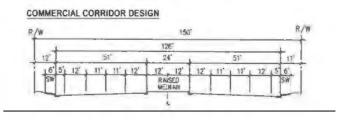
(20F2): CITY OF MURRIETA GENERAL PLAN ROADWAY CROSS-SECTIONS
